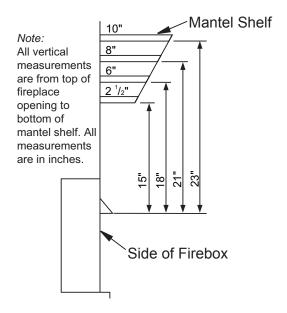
Minimum Mantel Clearances for Built-In Installation
